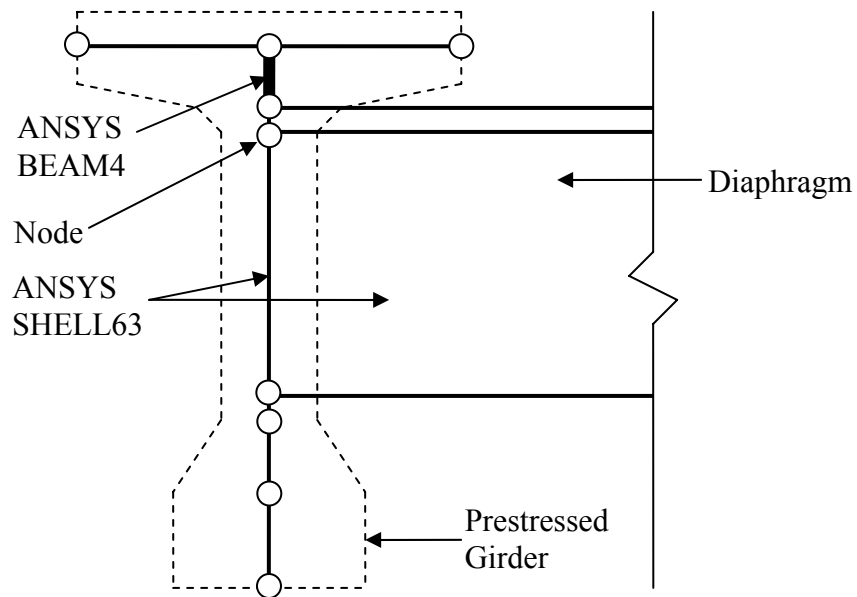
Cross Section of Bridge Girder (Structure 211)
